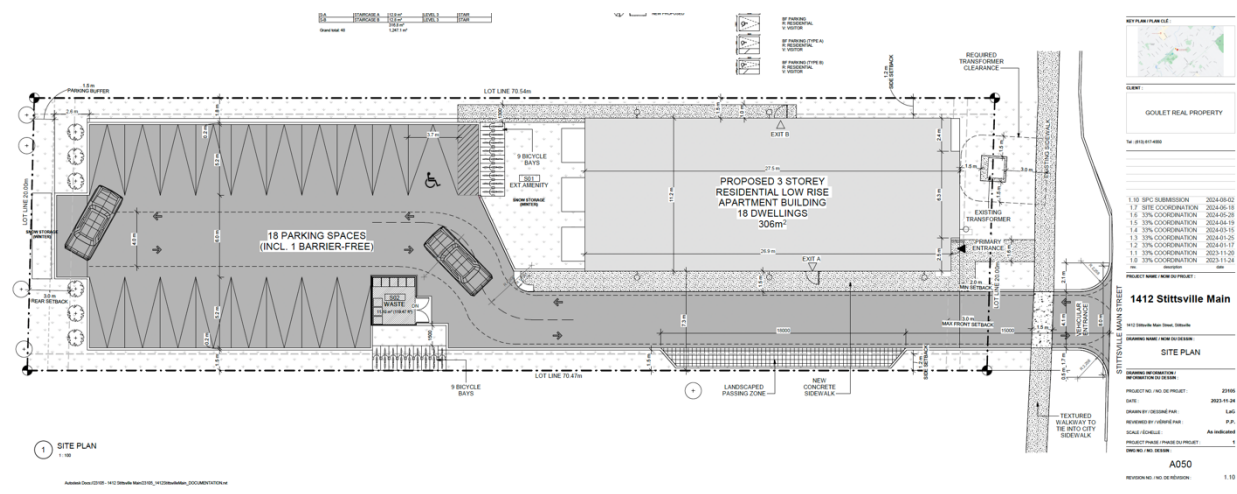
Extract of Site Plan (Source: Rossman Architecture).
